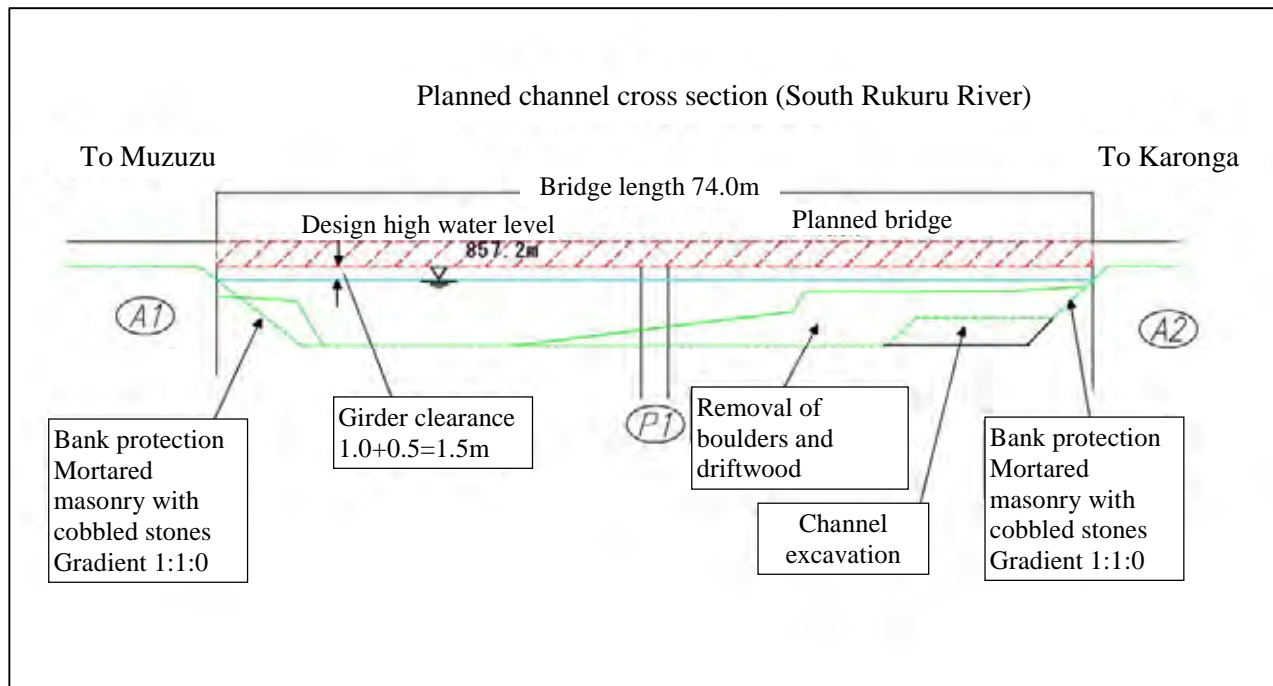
Planned River Channel Cross Section (at the bridge location)
